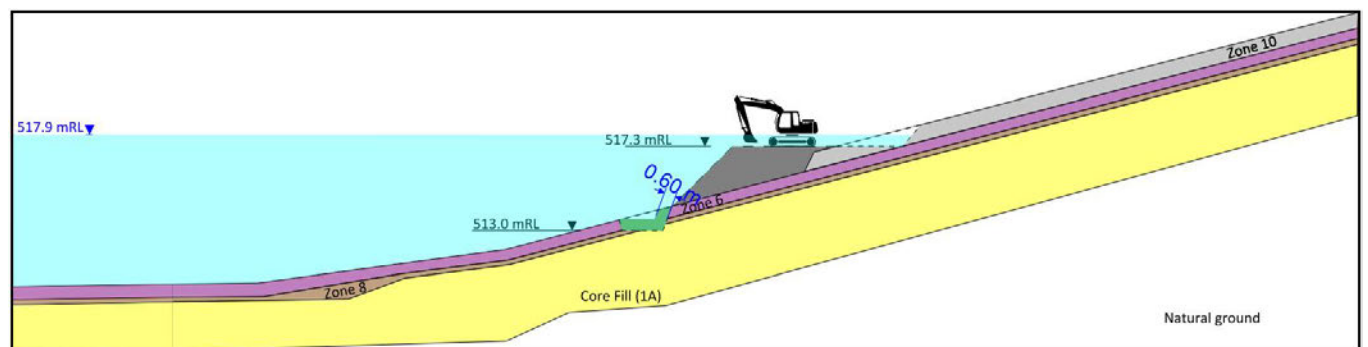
Schematic sketch – Tranche 1 – abutments - construction of key toe at 513.0 m RL and installation of rip-rap bedding
